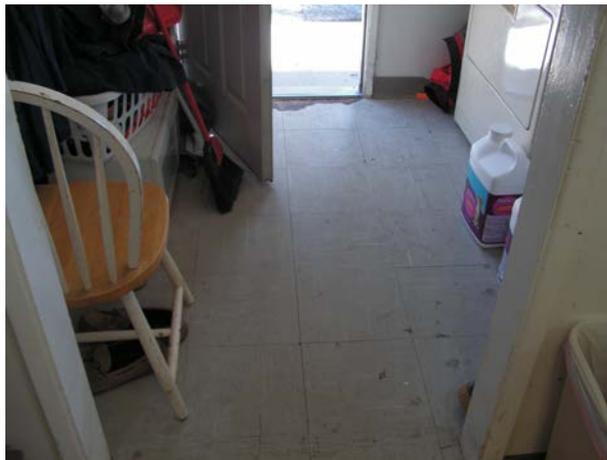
Gray 12-inch by 12-inch resilient floor tile, Building 6806 entry and beneath press-apply floor tiles
